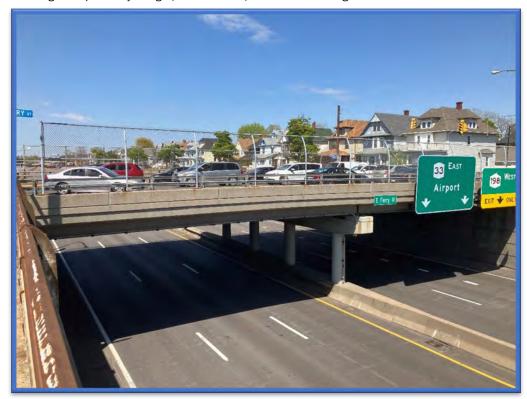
View to the southern side of the E Ferry Street Bridge over Kensington Expressway (Route 33) (BIN 1022640).
